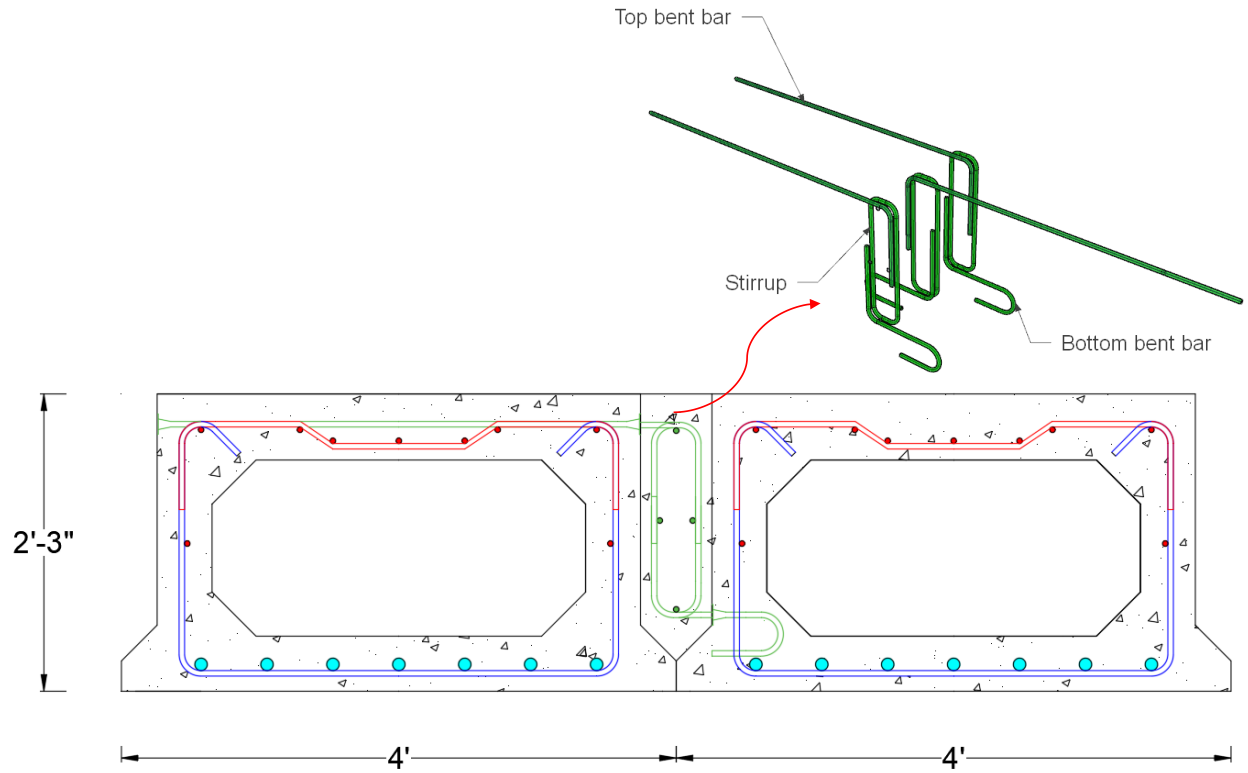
Design details of the experimental test setup, including the longitudinal joint and two adjacent box beams (1 in. = 2.54 cm).
